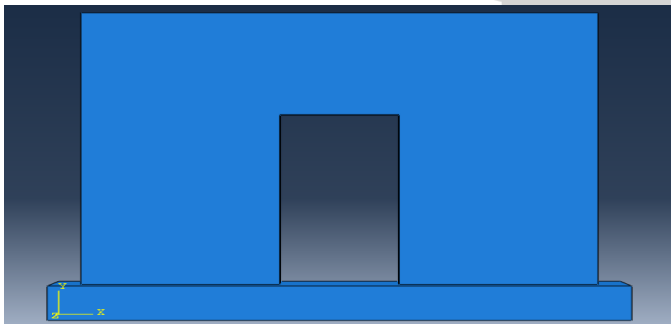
Model 6 Shear wall with size of opening 2.5 m x 1.2 m
